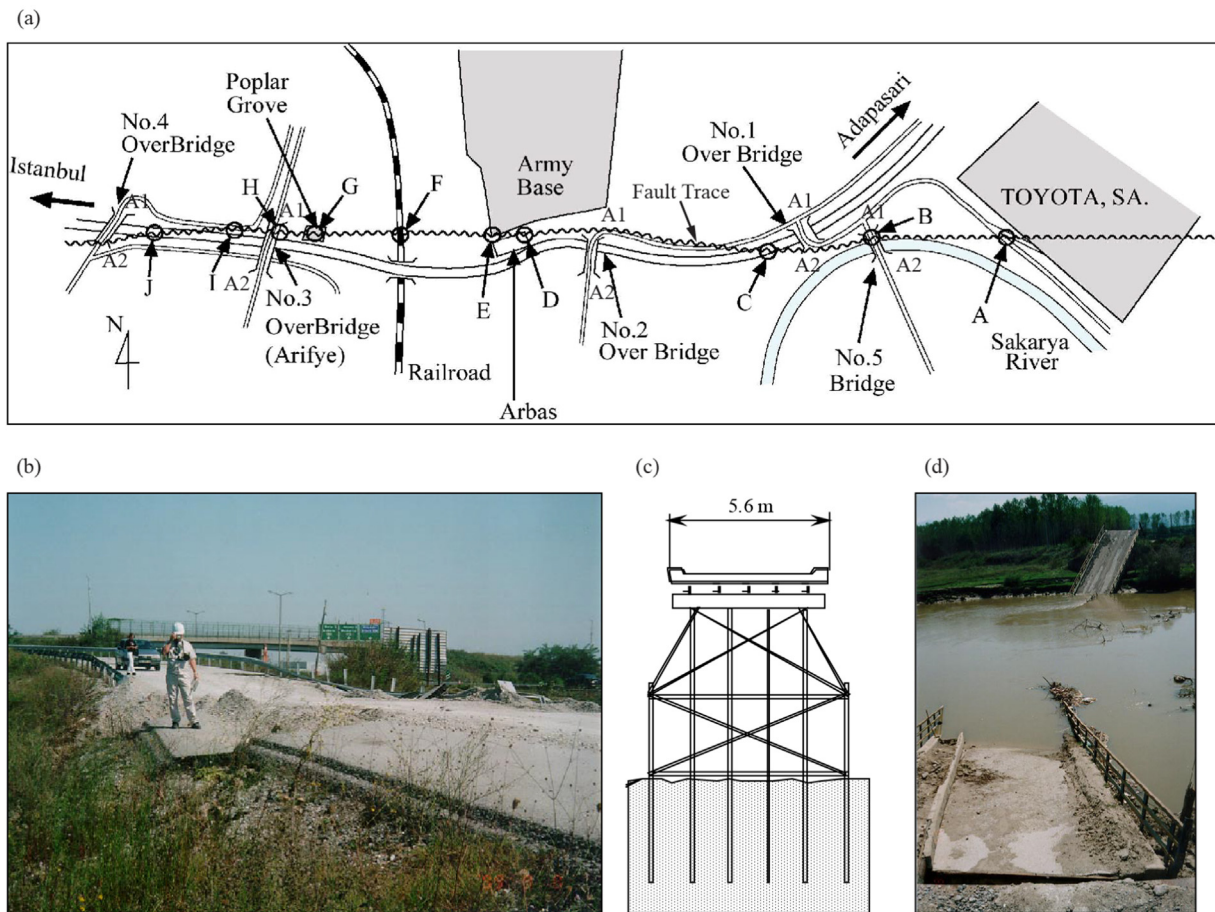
(a) Surface fault rupture of the 1999 Kocaeli earthquake passing through five bridges; (b) minor damage of No. 1 Overpass; (c) typical section of Sakarya Center Bridge; (d) collapsed Sakarya Center Bridge (Fig. 5a is modified from Kawashima [61,62]; Fig. 5b–d is reprinted from Kawashima [61,62]).
